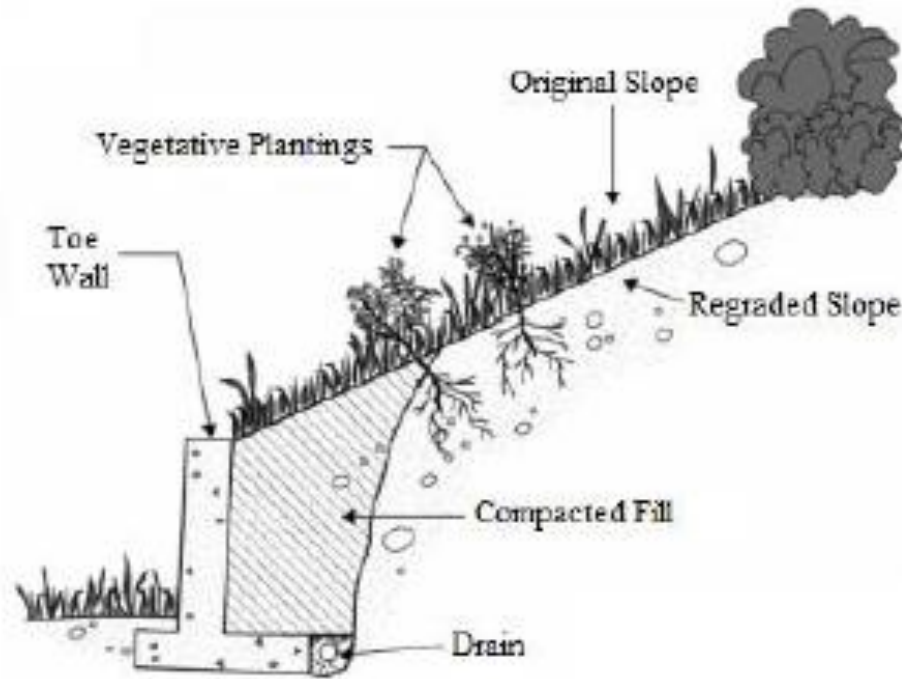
Low wall cross-section with planted vegetation for stabilization (USDA, 1992).
